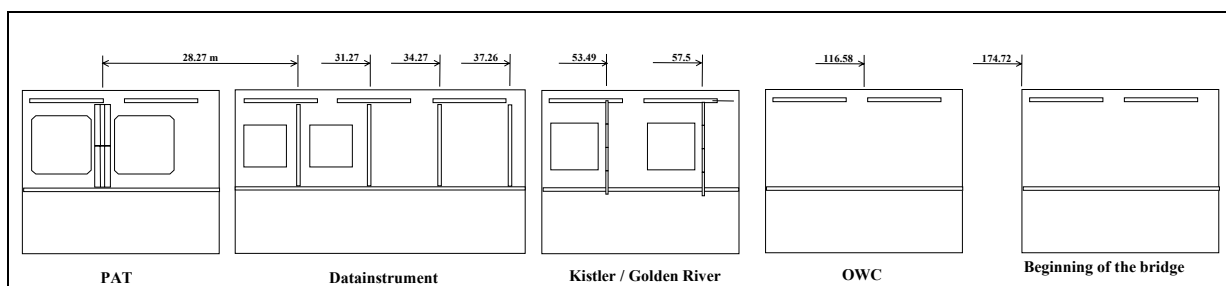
Four pavement WIM-systems installed at the Aleån test site
